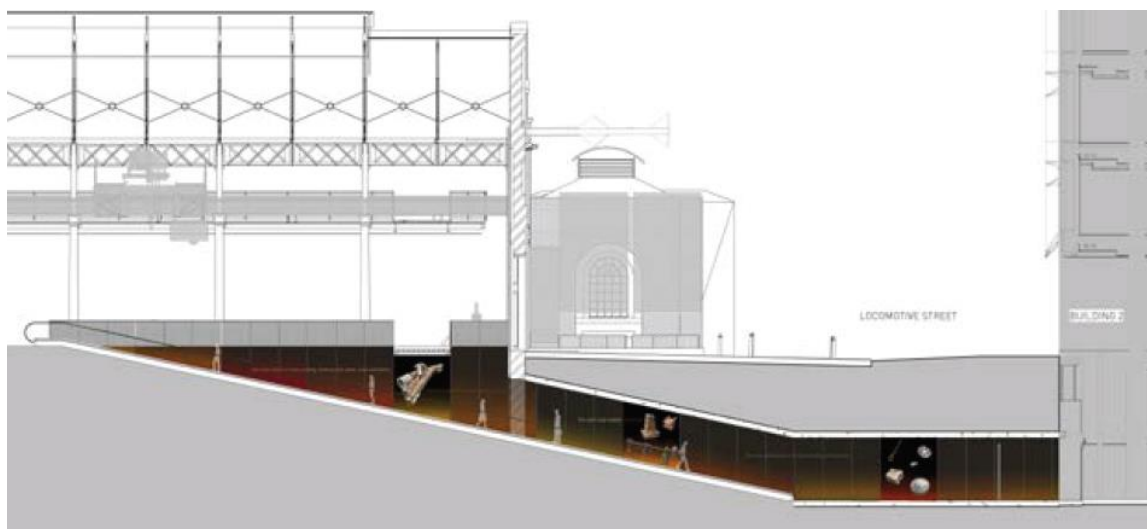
Proposed travelator connecting Building 2 to Bay 4 forms part of SSDA8517
